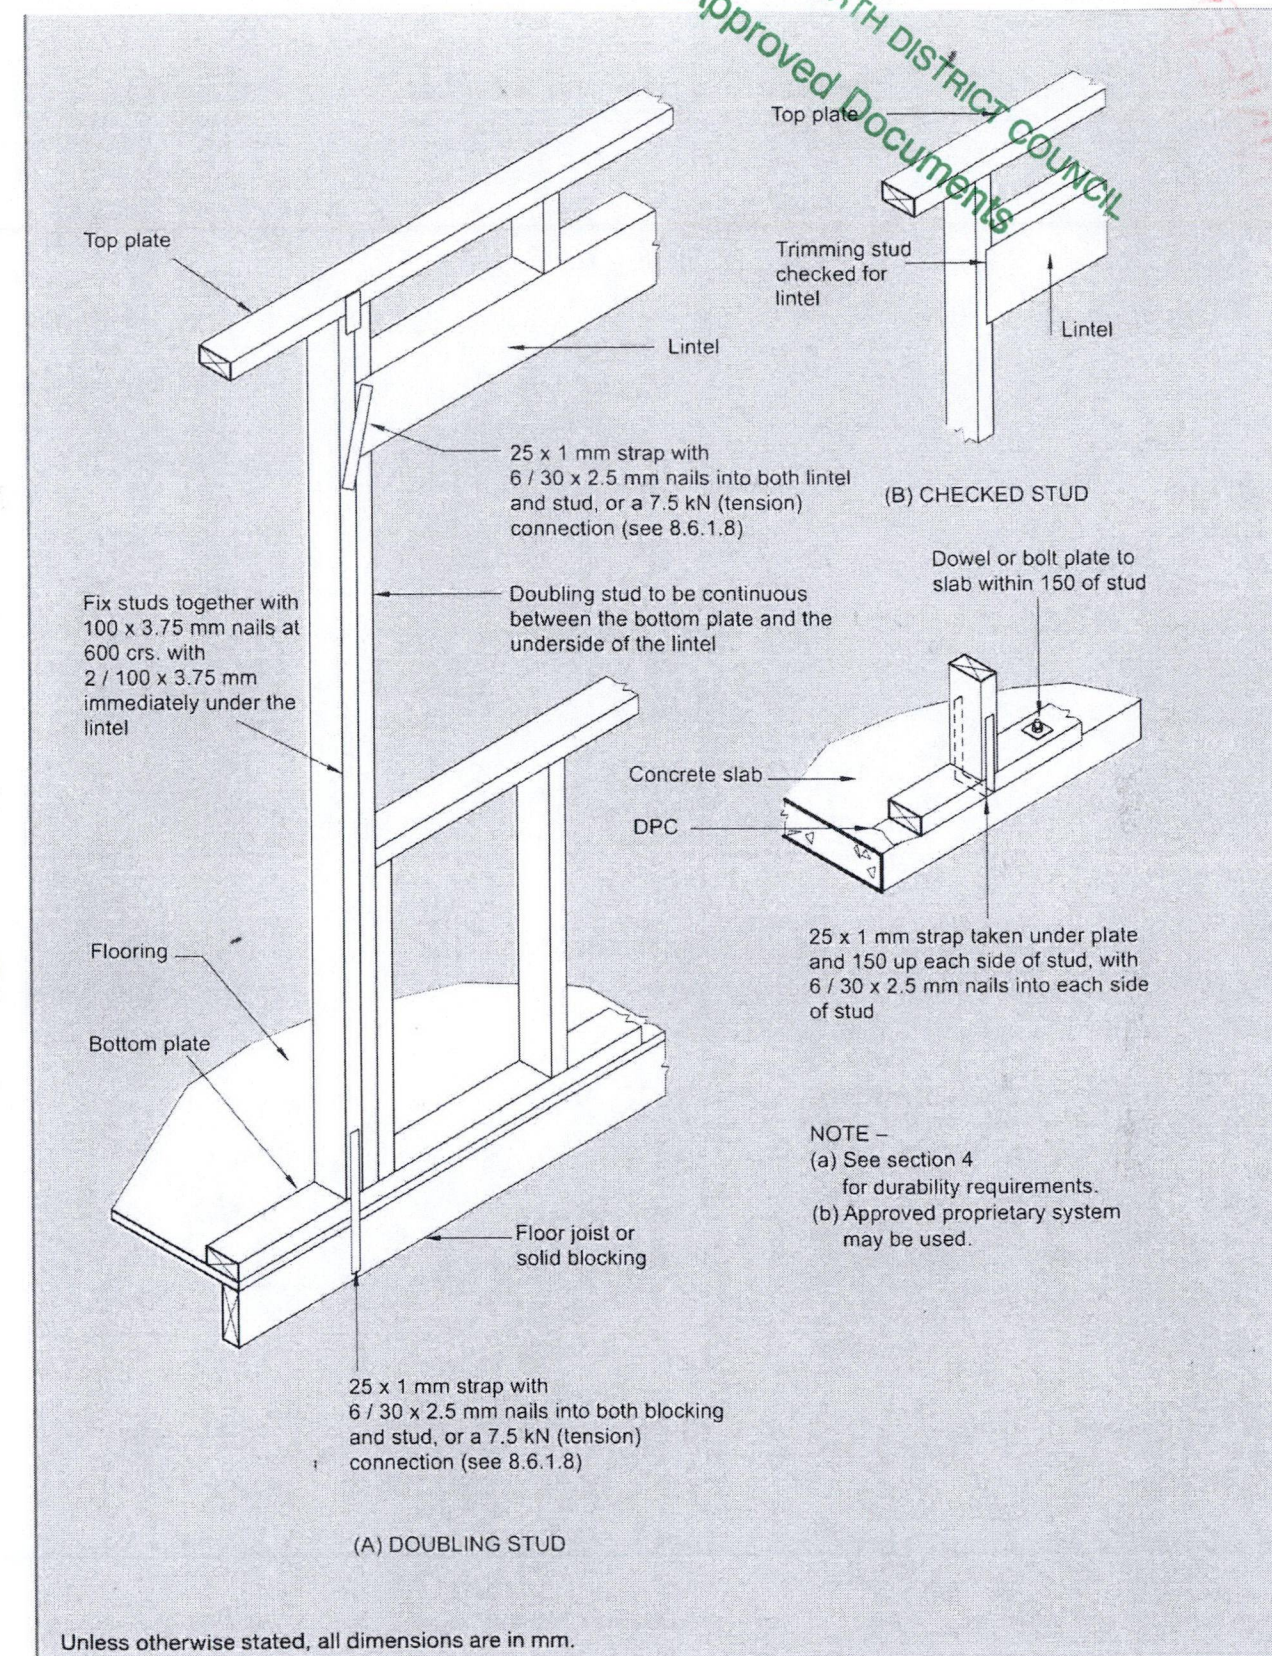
Lintel fixing to prevent uplift (see 8.6.1.8 and table 8.14 (a) and (b))
